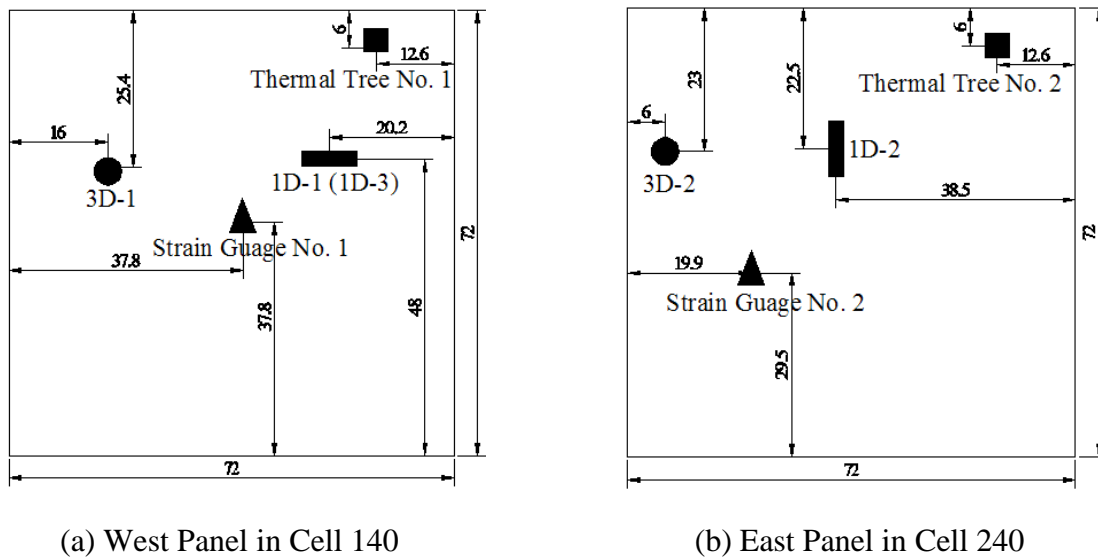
Sensor layouts on cell 40 (Unit: inch; 2.5cm). [Note: Sensor size not to scale.]
